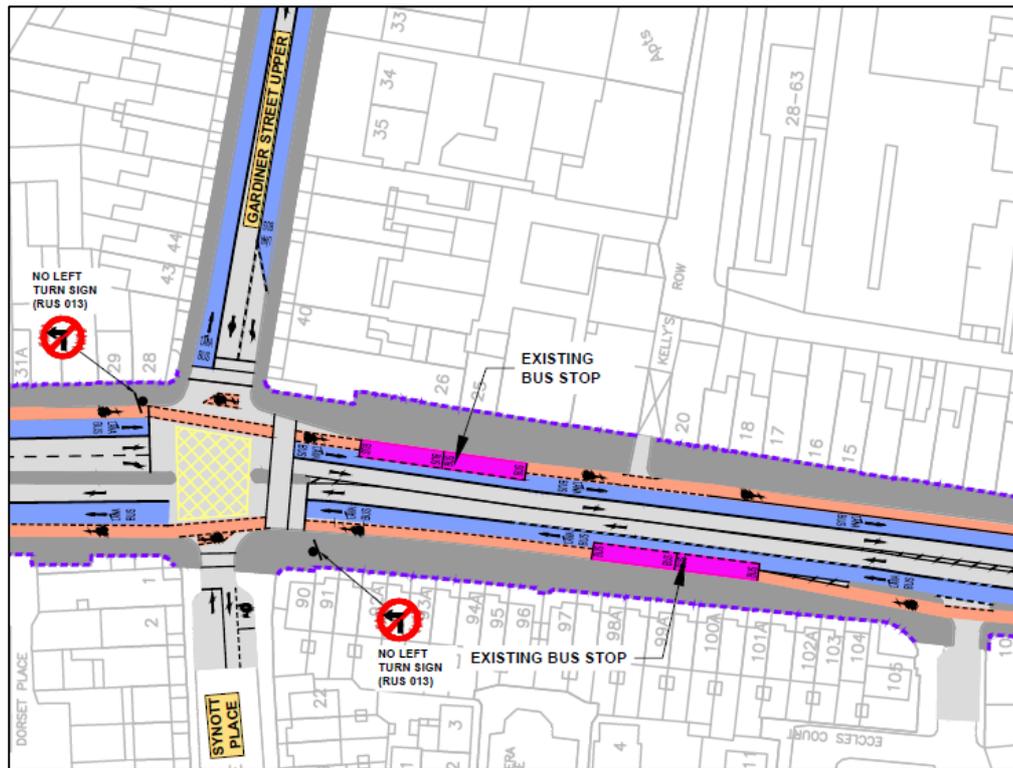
Gardiner Street Upper/Synott Place to Hardwicke Place/Eccles Street
